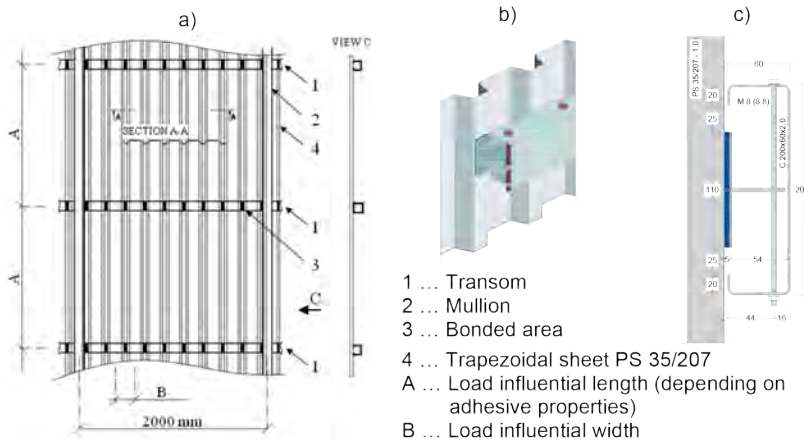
Façade with adhesively bonded connections a) technical view; b) schematic figure; c) cross section normal to the longitudinal axis
